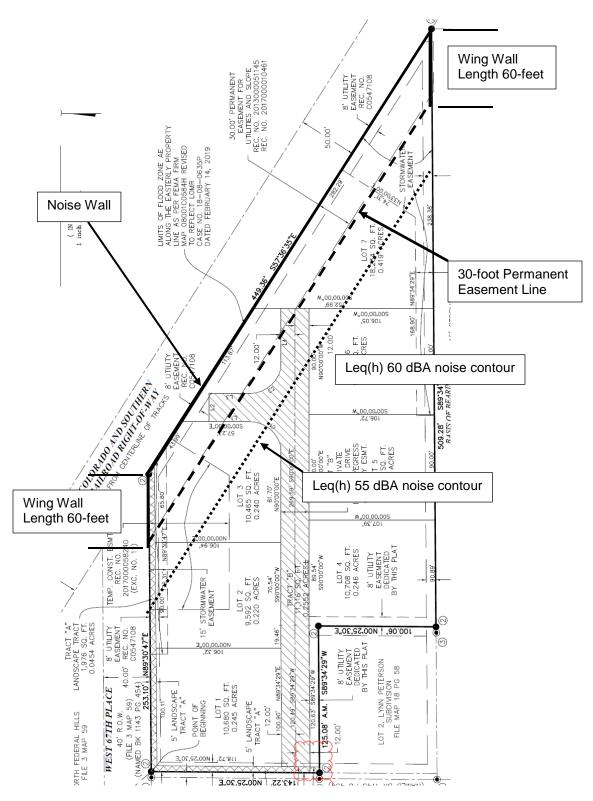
Light Rail and Heavy Rail Noise Contours with 10-foot high noise wall in place
